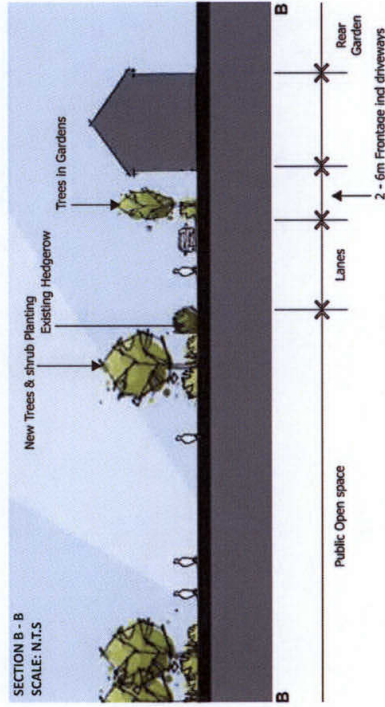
DETAIL LOCATION - THE LANES / SHARED DRIVEWAYS
